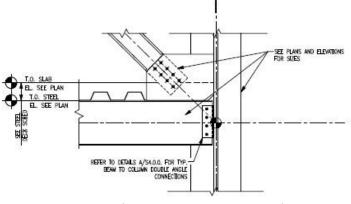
Diagonal Brace Connection at Column Drawings Courtesy of JCJ Architecture
